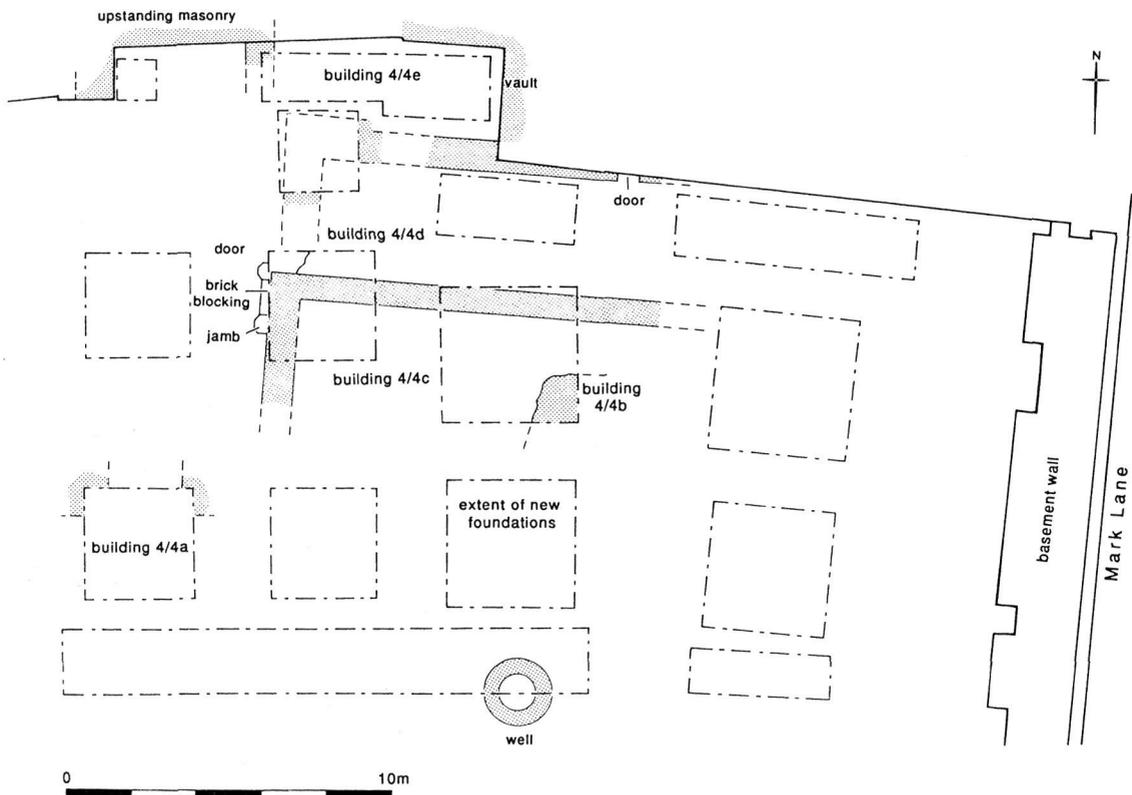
Composite plan of the medieval walls and well found at 26–28 Mark Lane (site 4/3)
